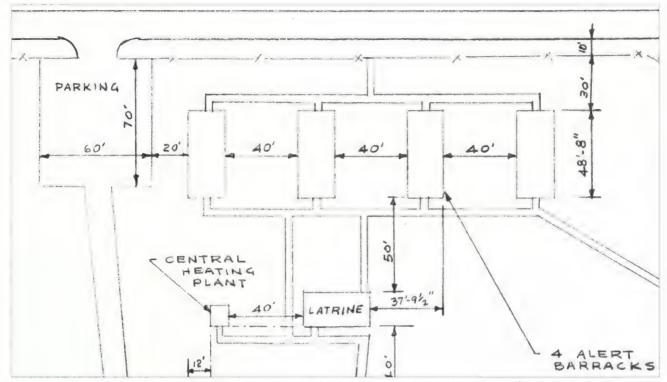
Plan of the Ready Barracks, NIKE radar site, 1962. The plan shows a parking lot layout west of the barracks that currently holds a stockpile of yellow brick for Fort Hancock buildings. The brick should be stacked on to palettes and moved to the maintenance yard at Fort Hancock (GATE 11057).
